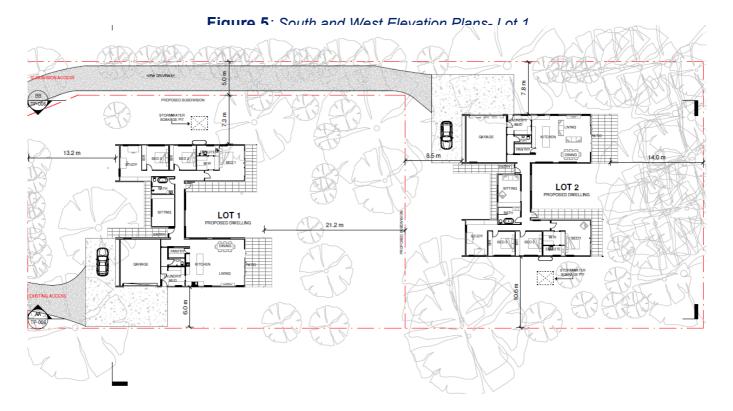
Site Layout plan showing the orientation of the proposed dwellings, setbacks and onsite carparking provisions
